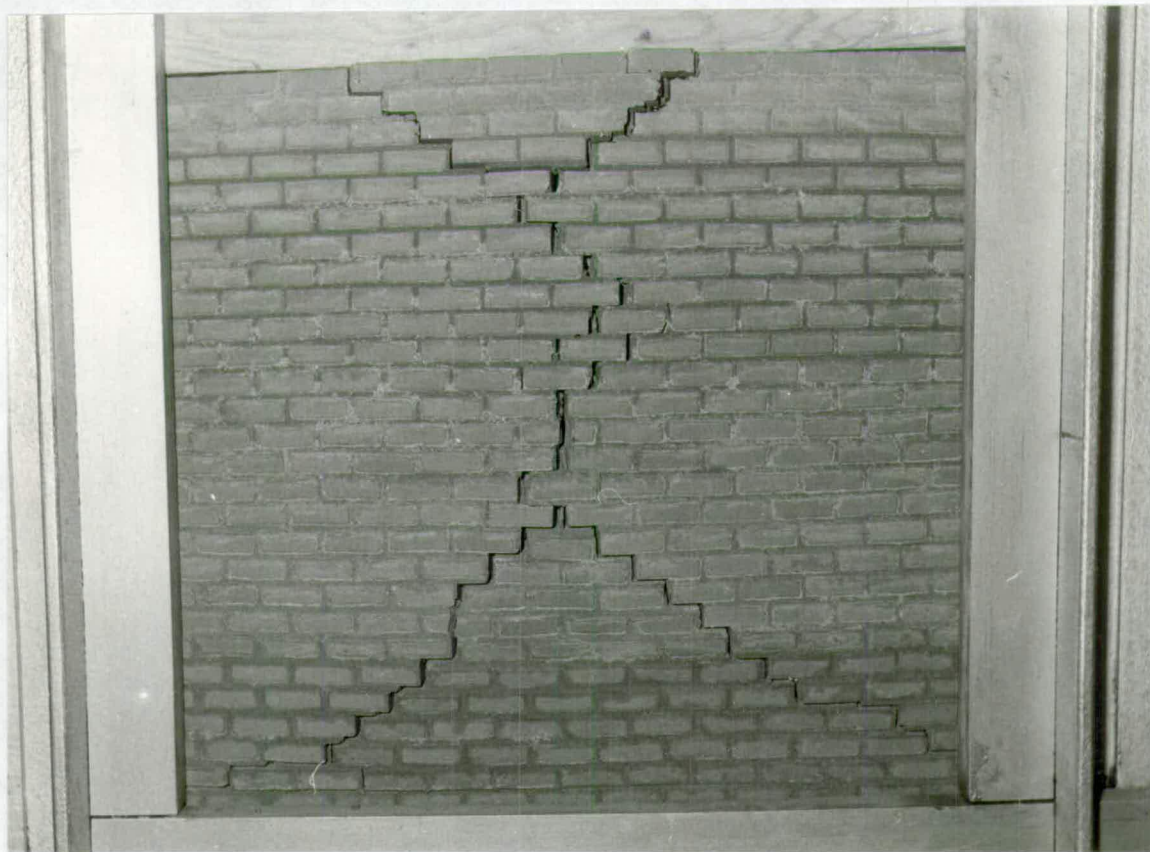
FAILURE OF WALL A3 - 3 SIDES SUPPORTED
